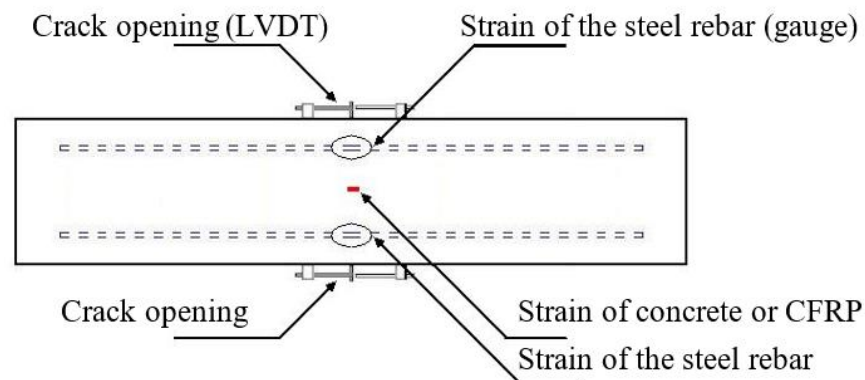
Instrumentation layout of the soffit of a beam (under view).
